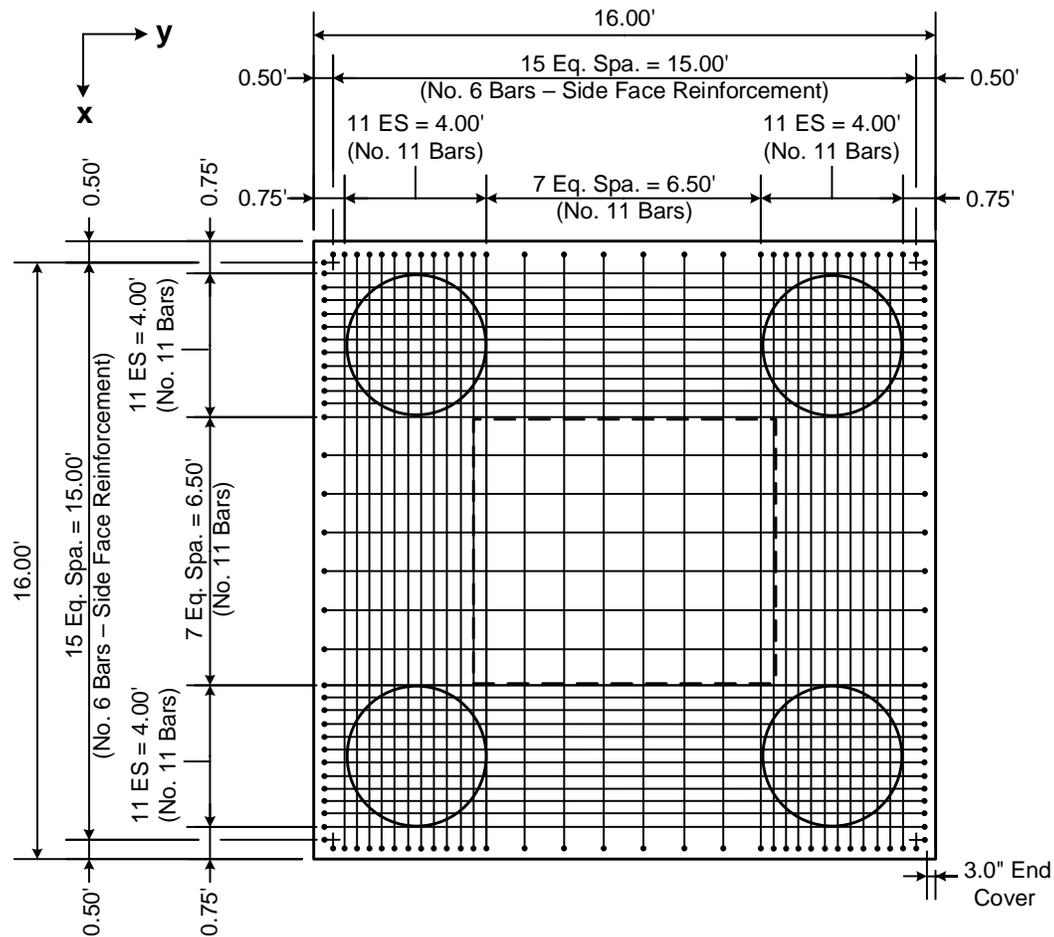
Reinforcement Details 4 - Section A-A of Figure 4-24
